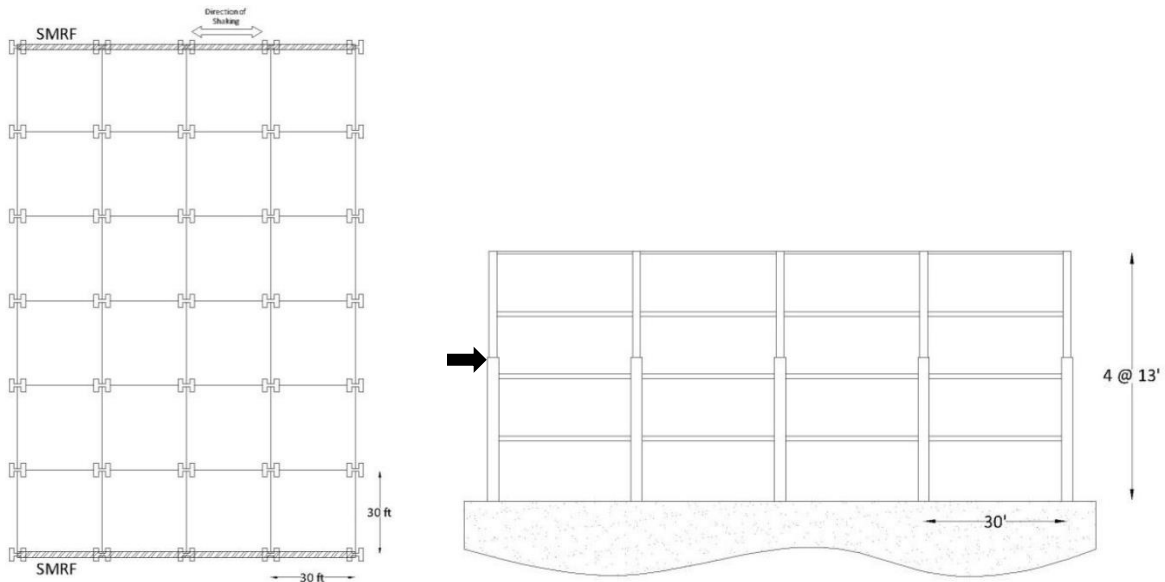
Plan and Elevation View of the 4-story SMRF (Shaw, 2013)
